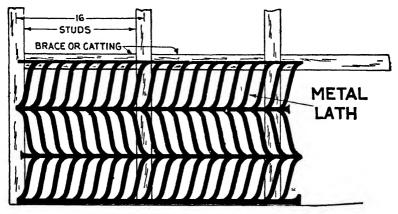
,866.—Metal lath placed on lath and forming a foundation for wall tile.
